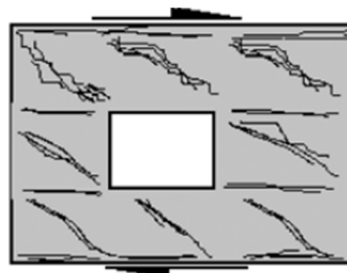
Possible Failure in both Spandrel or Pier Portion
